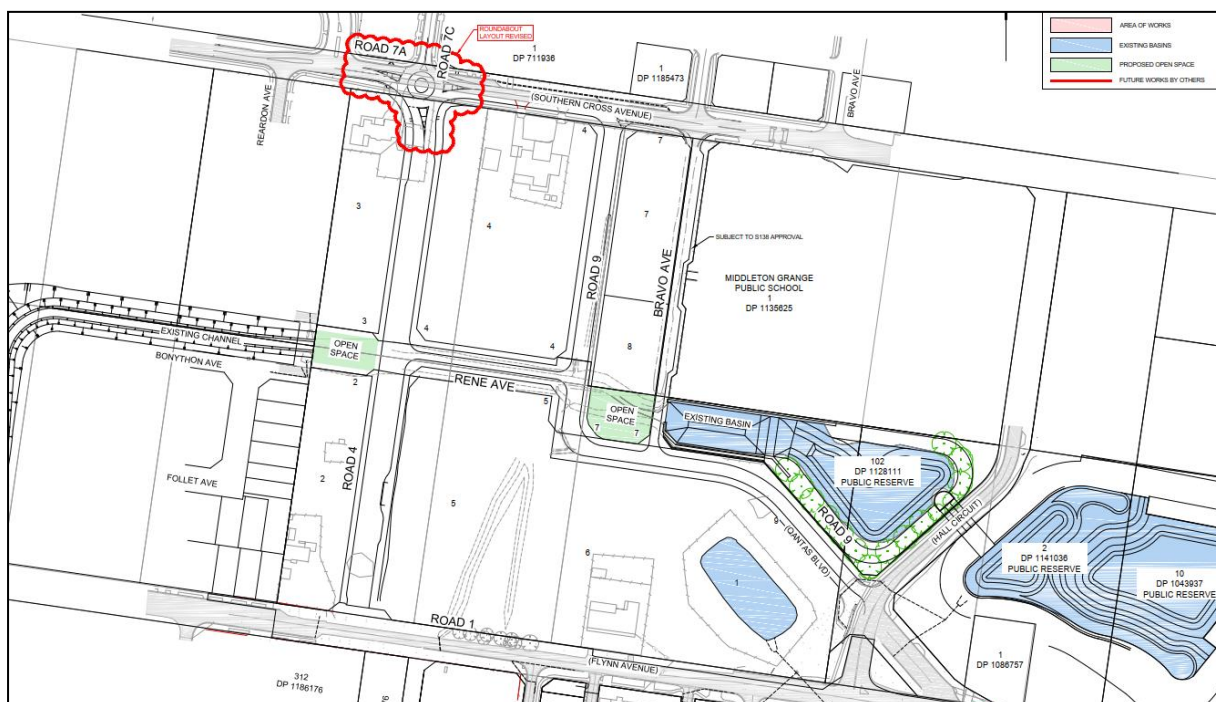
DA-64/2007/F – approved subdivision and roads design
